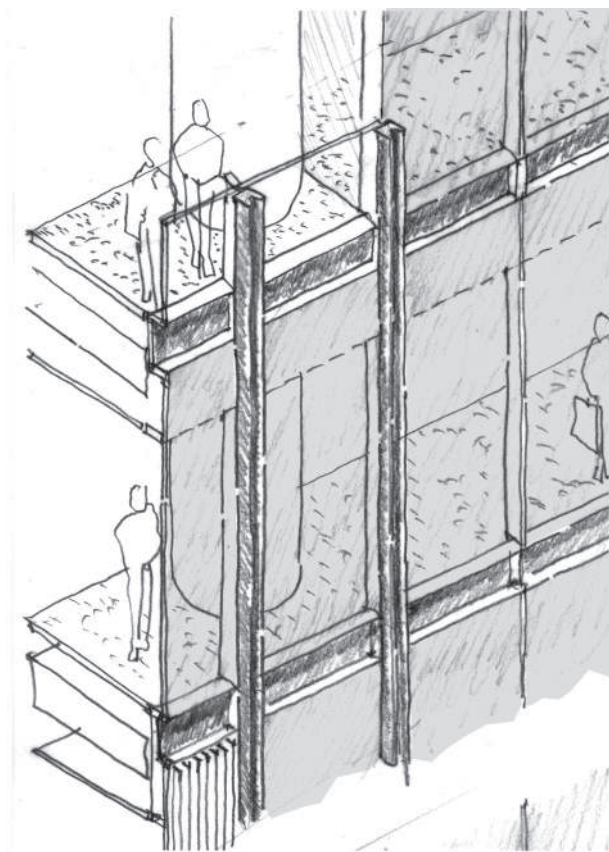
Detail of vertical fins applied to tower glazing and louvre banks at podium levels
